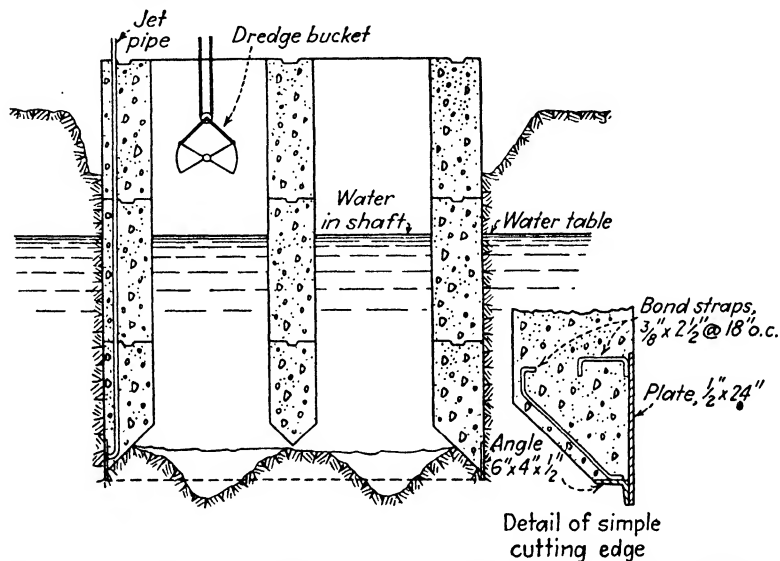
Concrete open caisson for sinking large shafts to rock through soft overburden.
